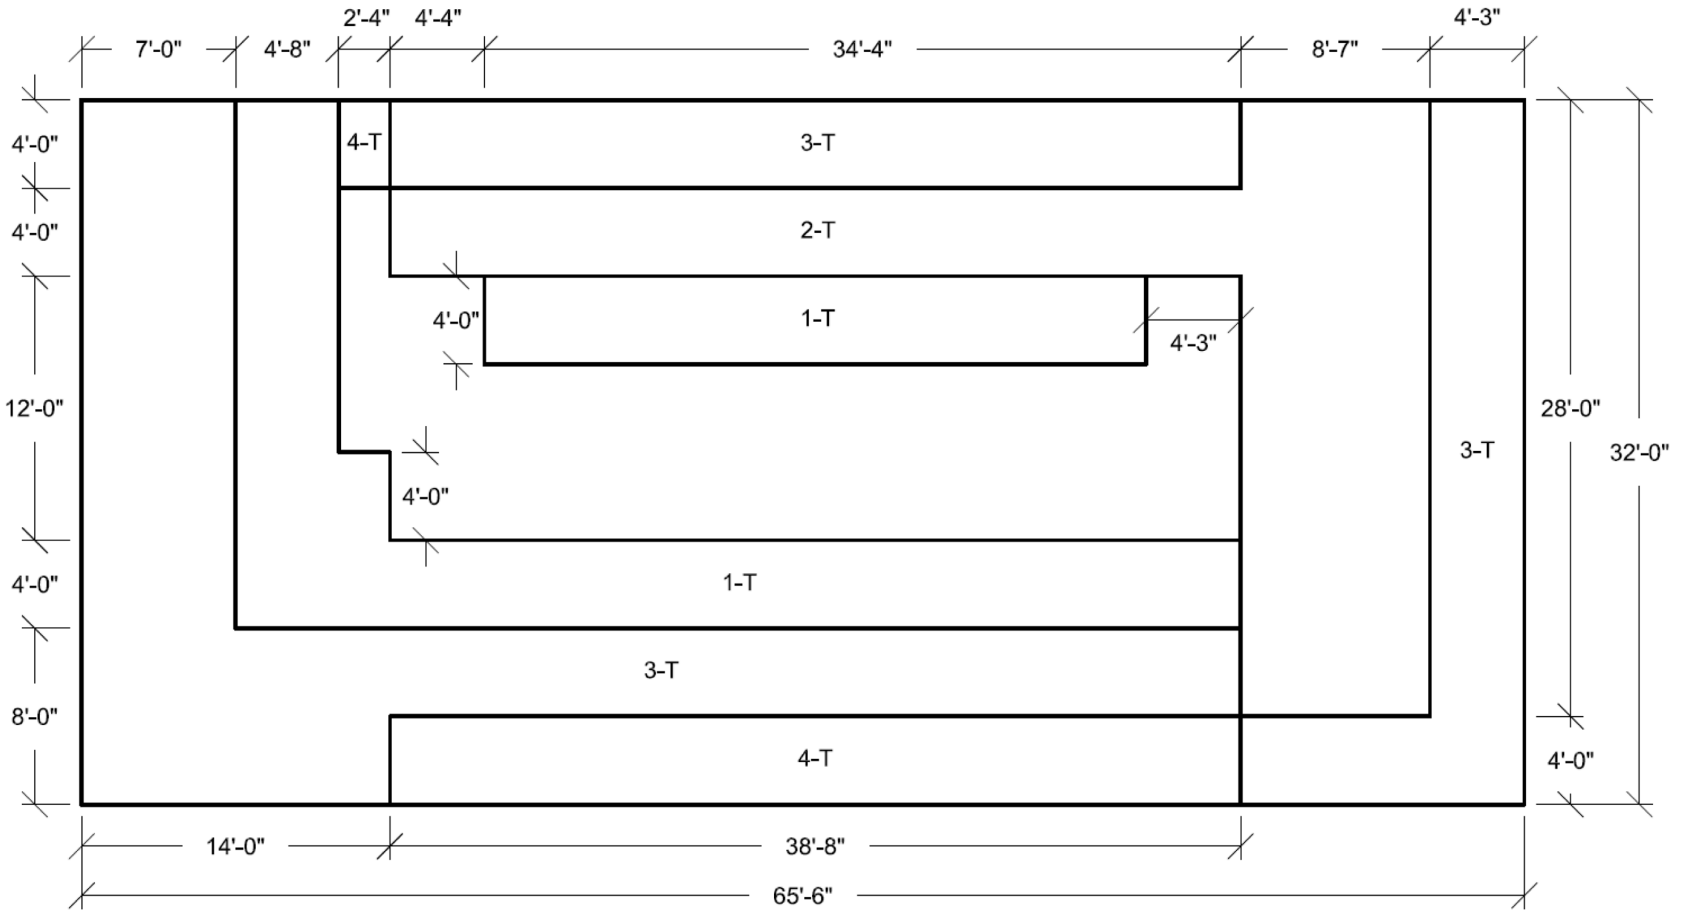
H.6-172 DGFOV Wall 8 Looking From Outside Transverse Reinforcement Zones
